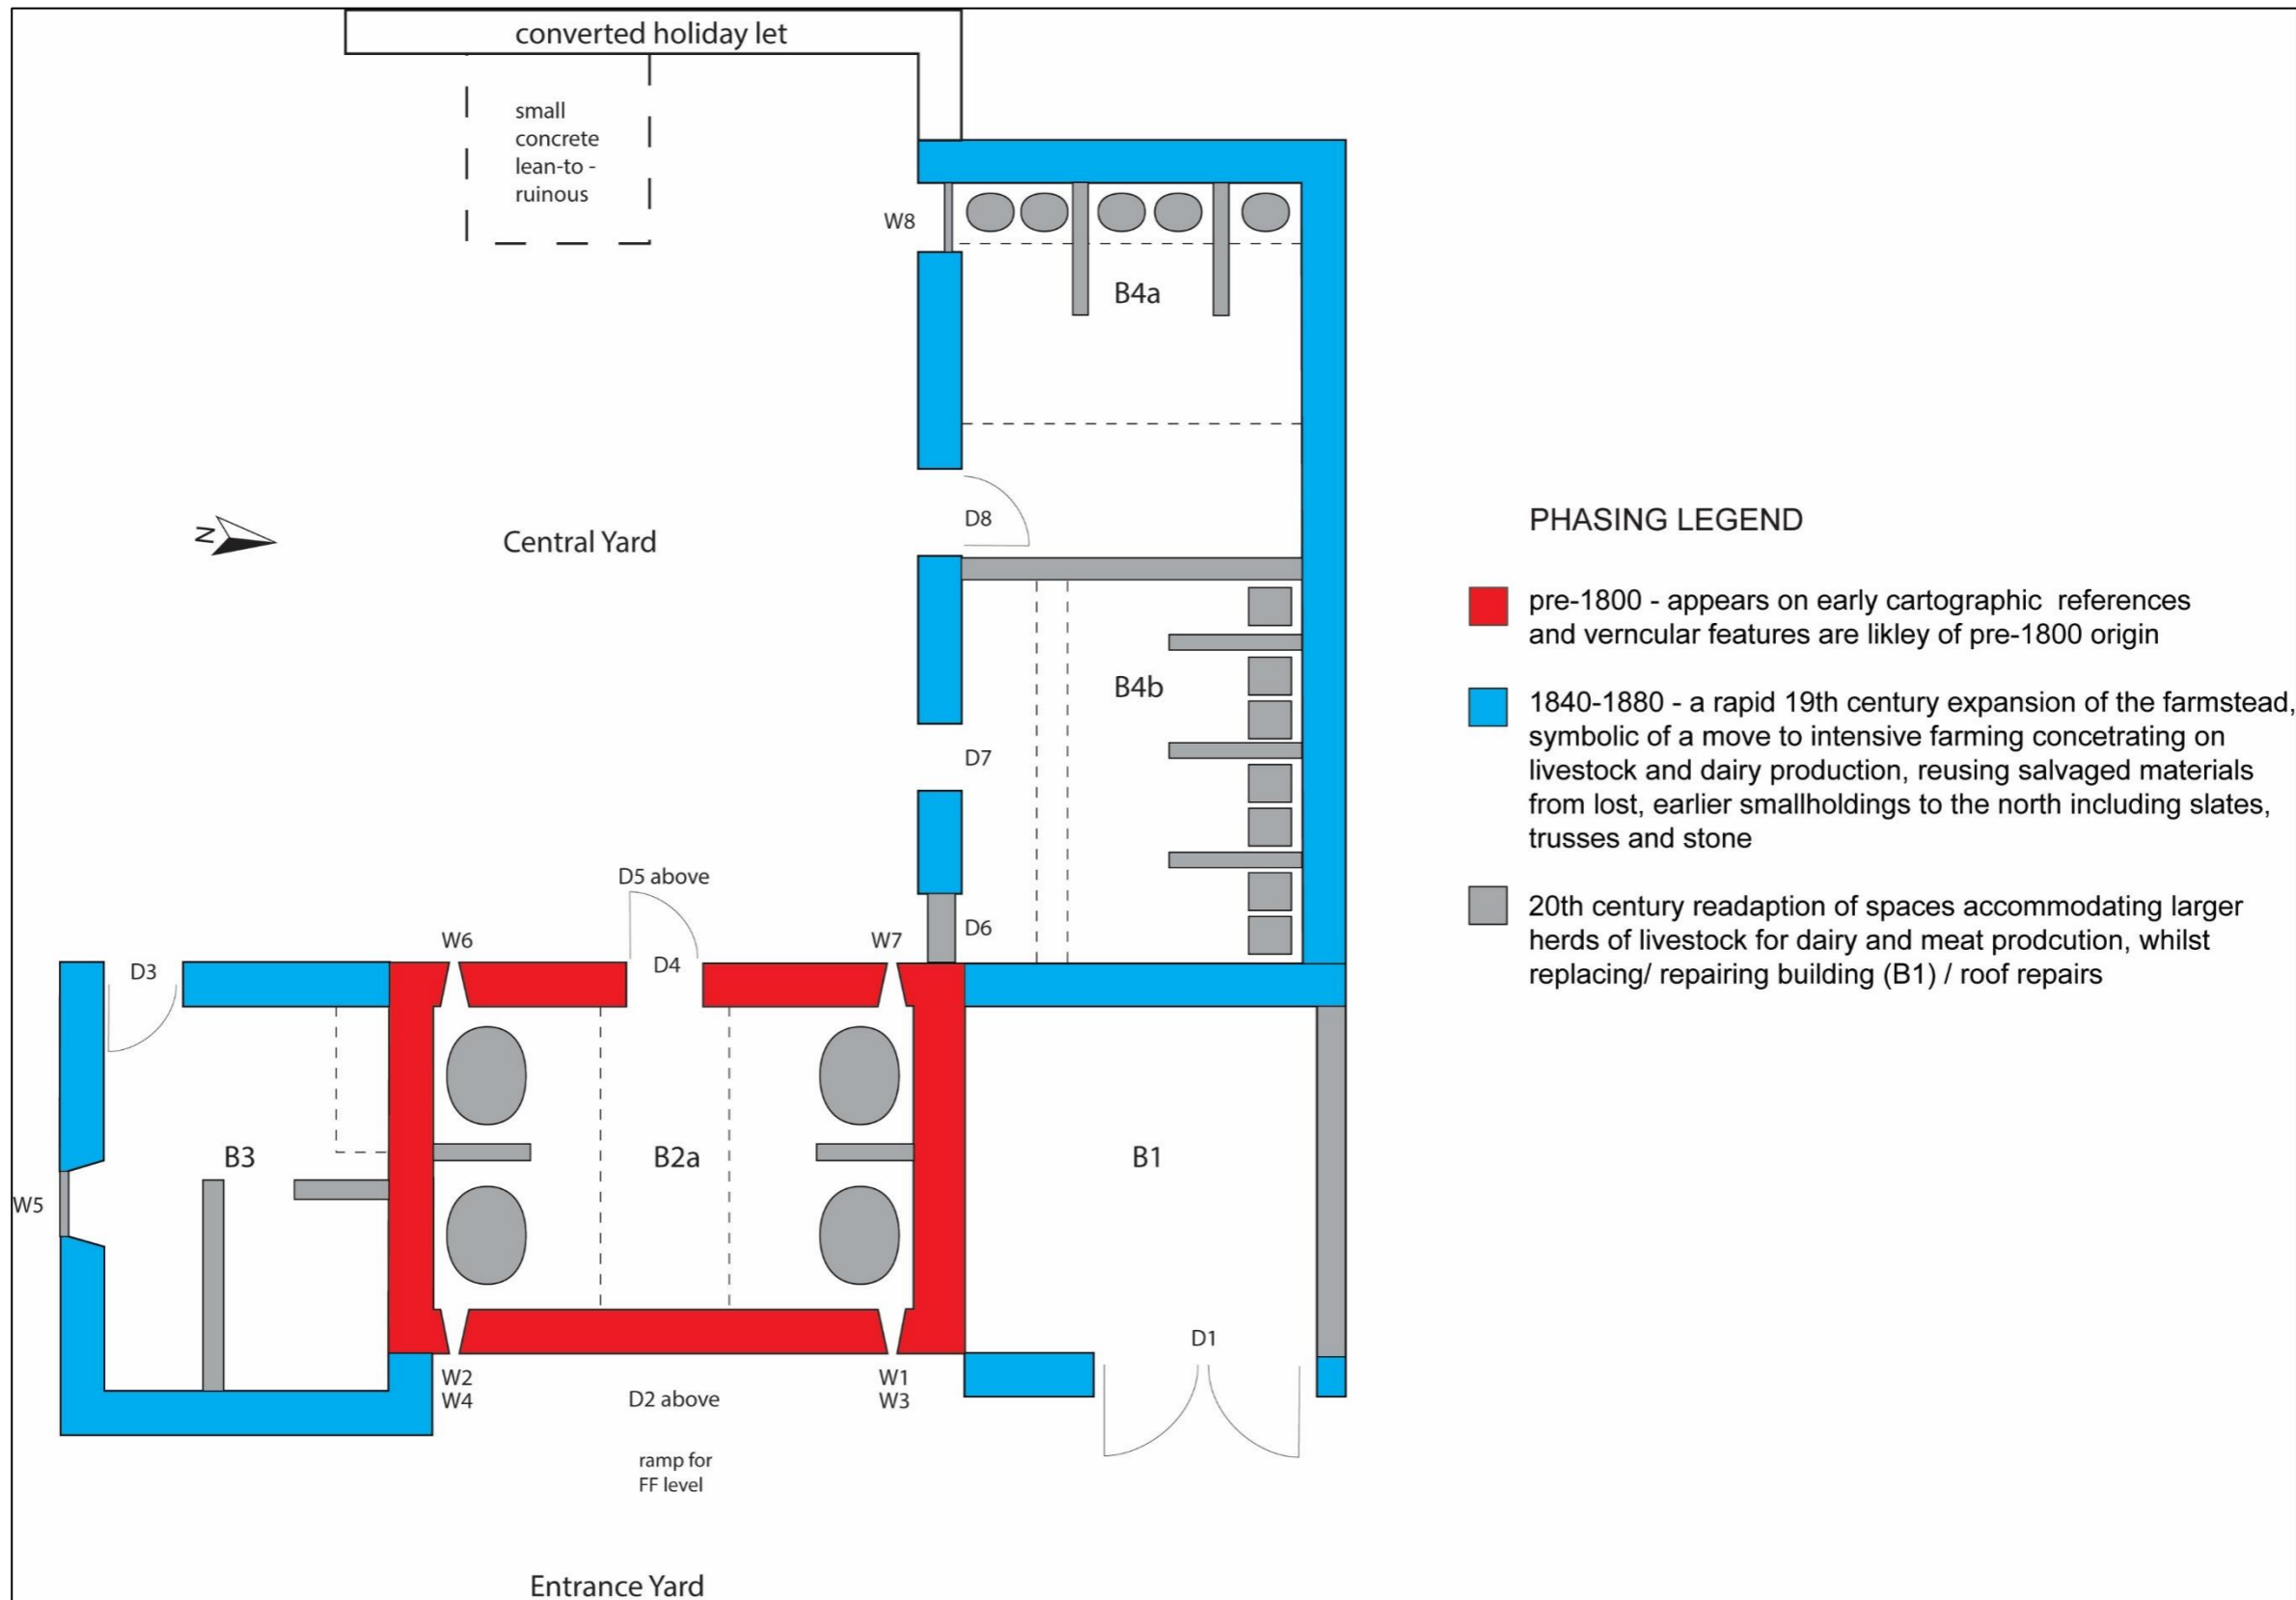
PLANS OF BUILDINGS SHOWING PHASING, NOT FULLY TO SCALE, FOR ILLUSTRATIVE PURPOSES ONLY.
